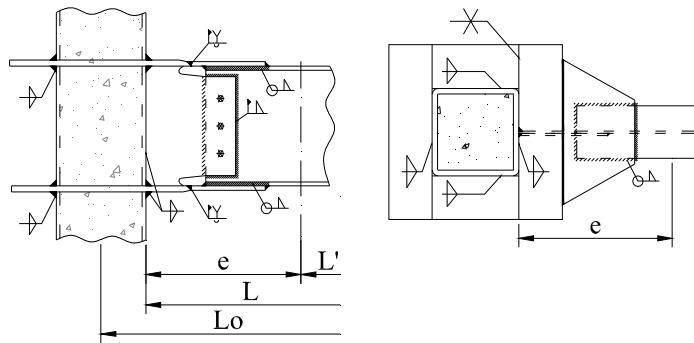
Welded beam to column joint with cover plates
